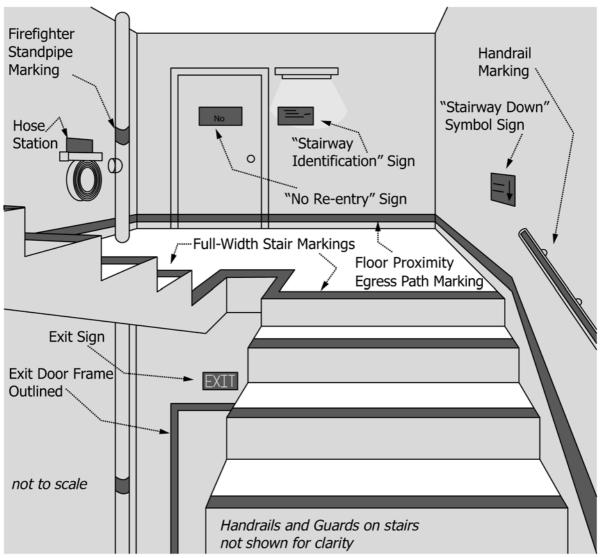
Wall and Floor Markings in an Enclosed Stairway
